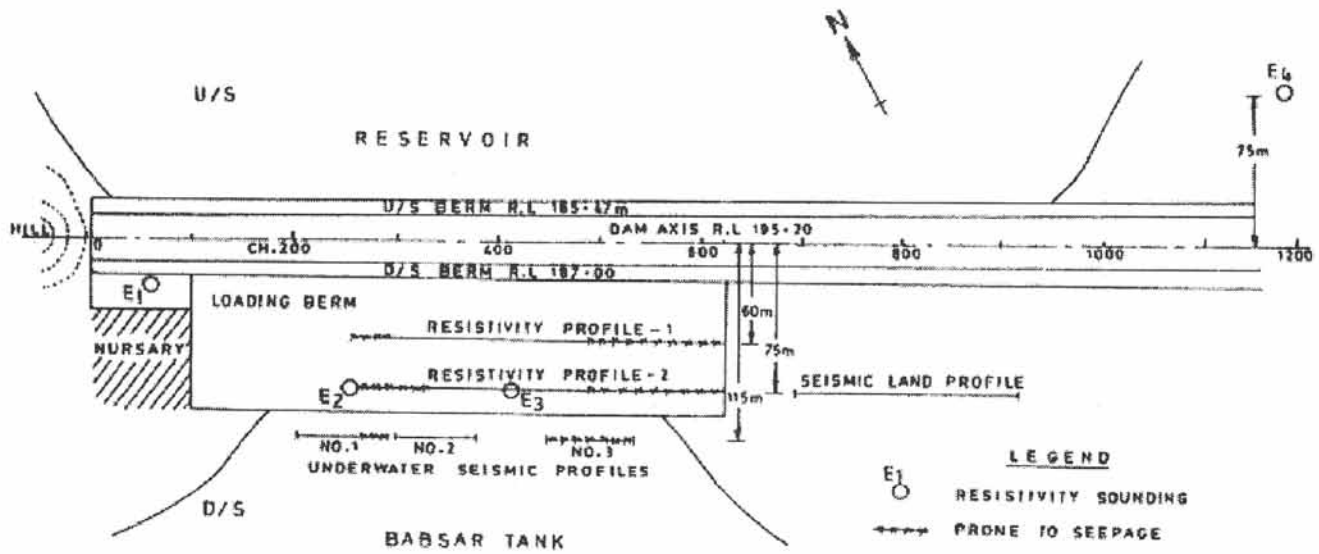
Plan showing location of Seismic, Electrical Profiles & Sounding
